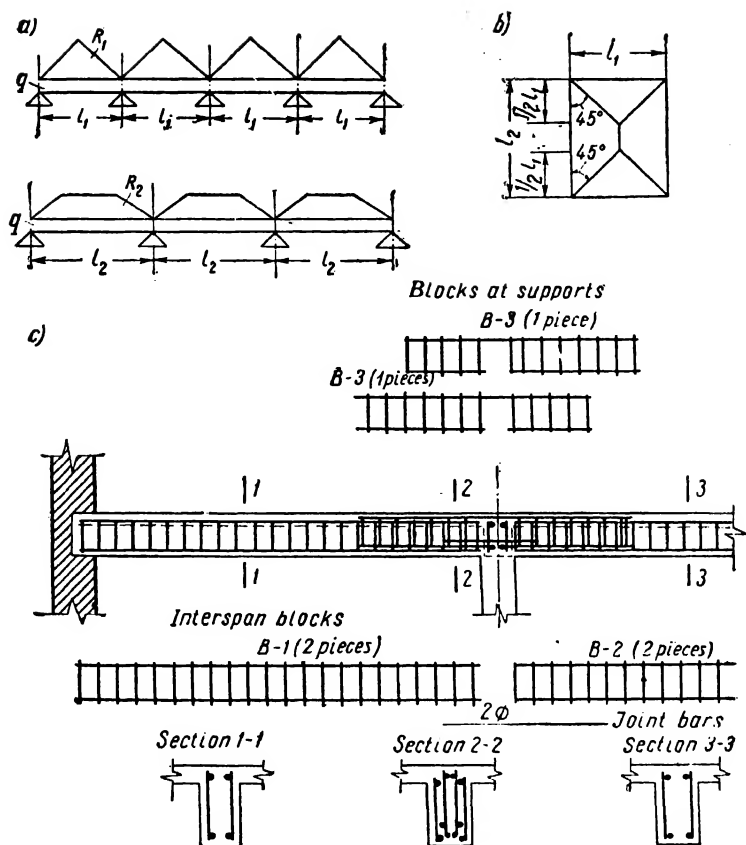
Design diagrams and reinforcement delineations for beams supporting two-way slabs
